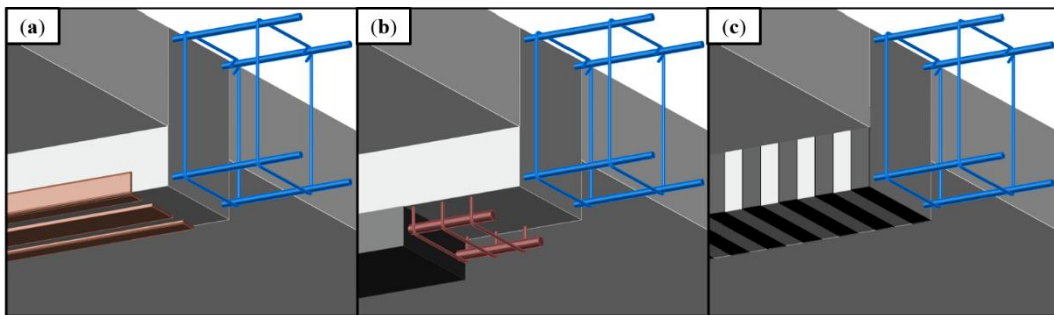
Most common methods for the retrofitting of the RC beams: (a) steel plates system; (b) increase in RC cross-section of the beam; (c) FRP strips.
